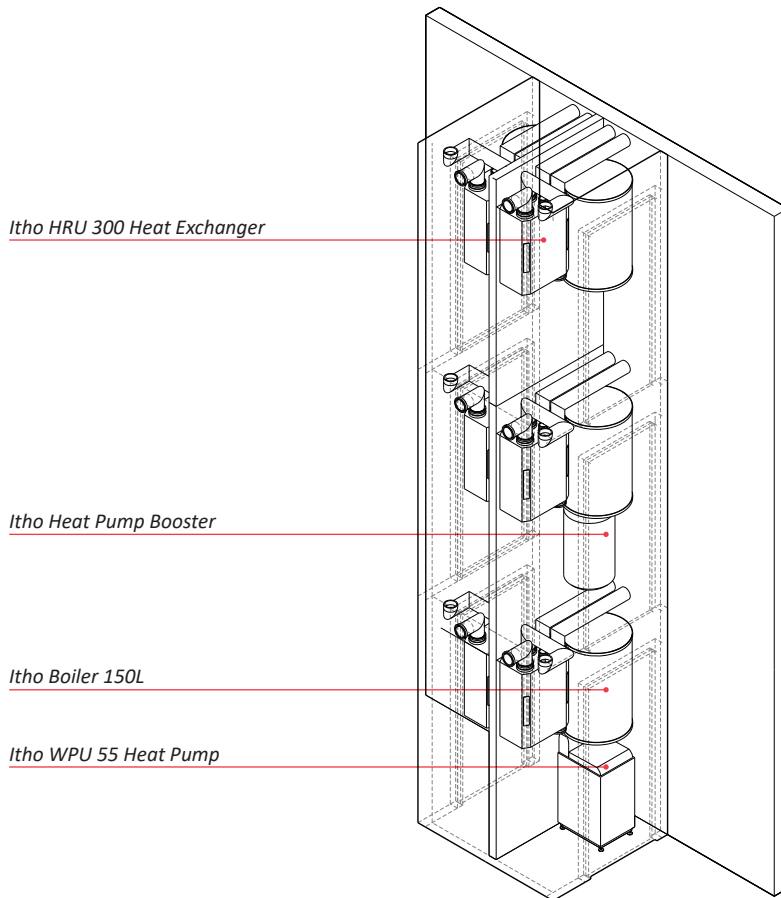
Isometric view of the installation box located on the north facade, two installation boxes provide heat, warm water and ventilation for all twelve apartments (Own Illustration).
